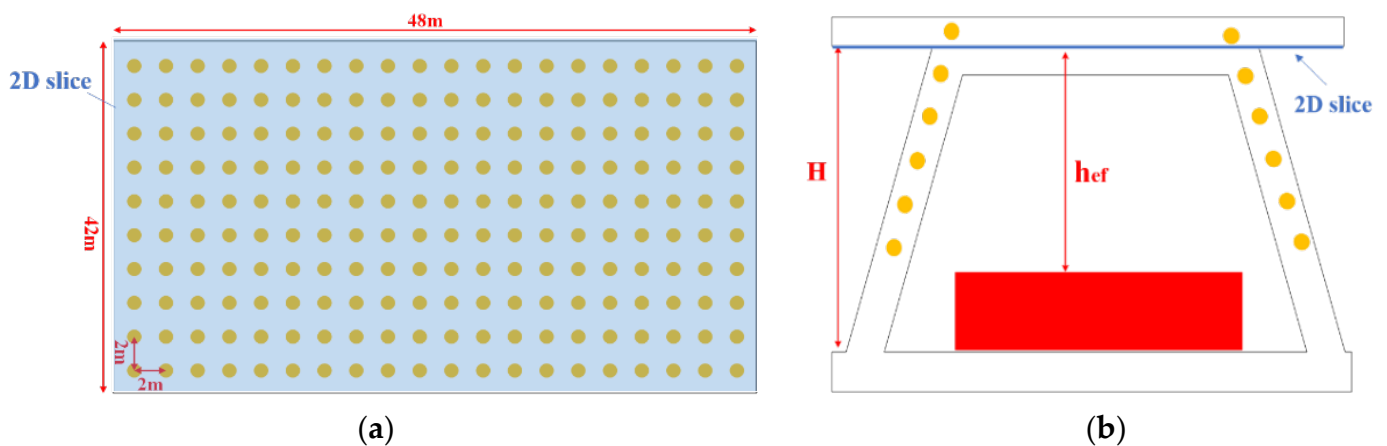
Thermocouple distribution in the truss and ceiling of double-deck bridge model: (a) bottom of ceiling; (b) inner surface of truss.
